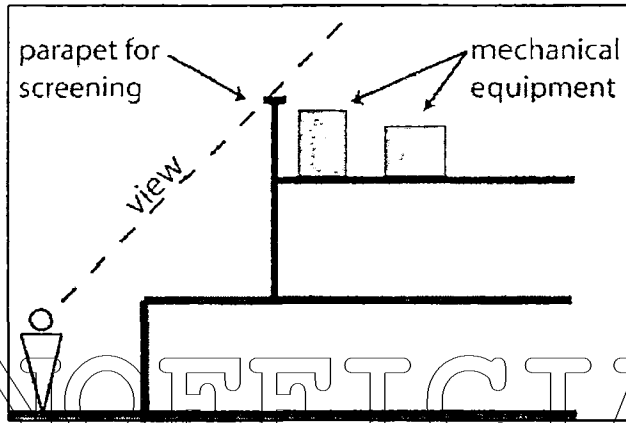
K: Mechanical and electrical equipment mounted on flat roofs must be screened so that an individual within 100 feet of the building will be unable to view it.
